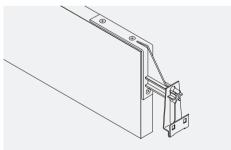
Securing the starter bracket onto the corner of the fascia
